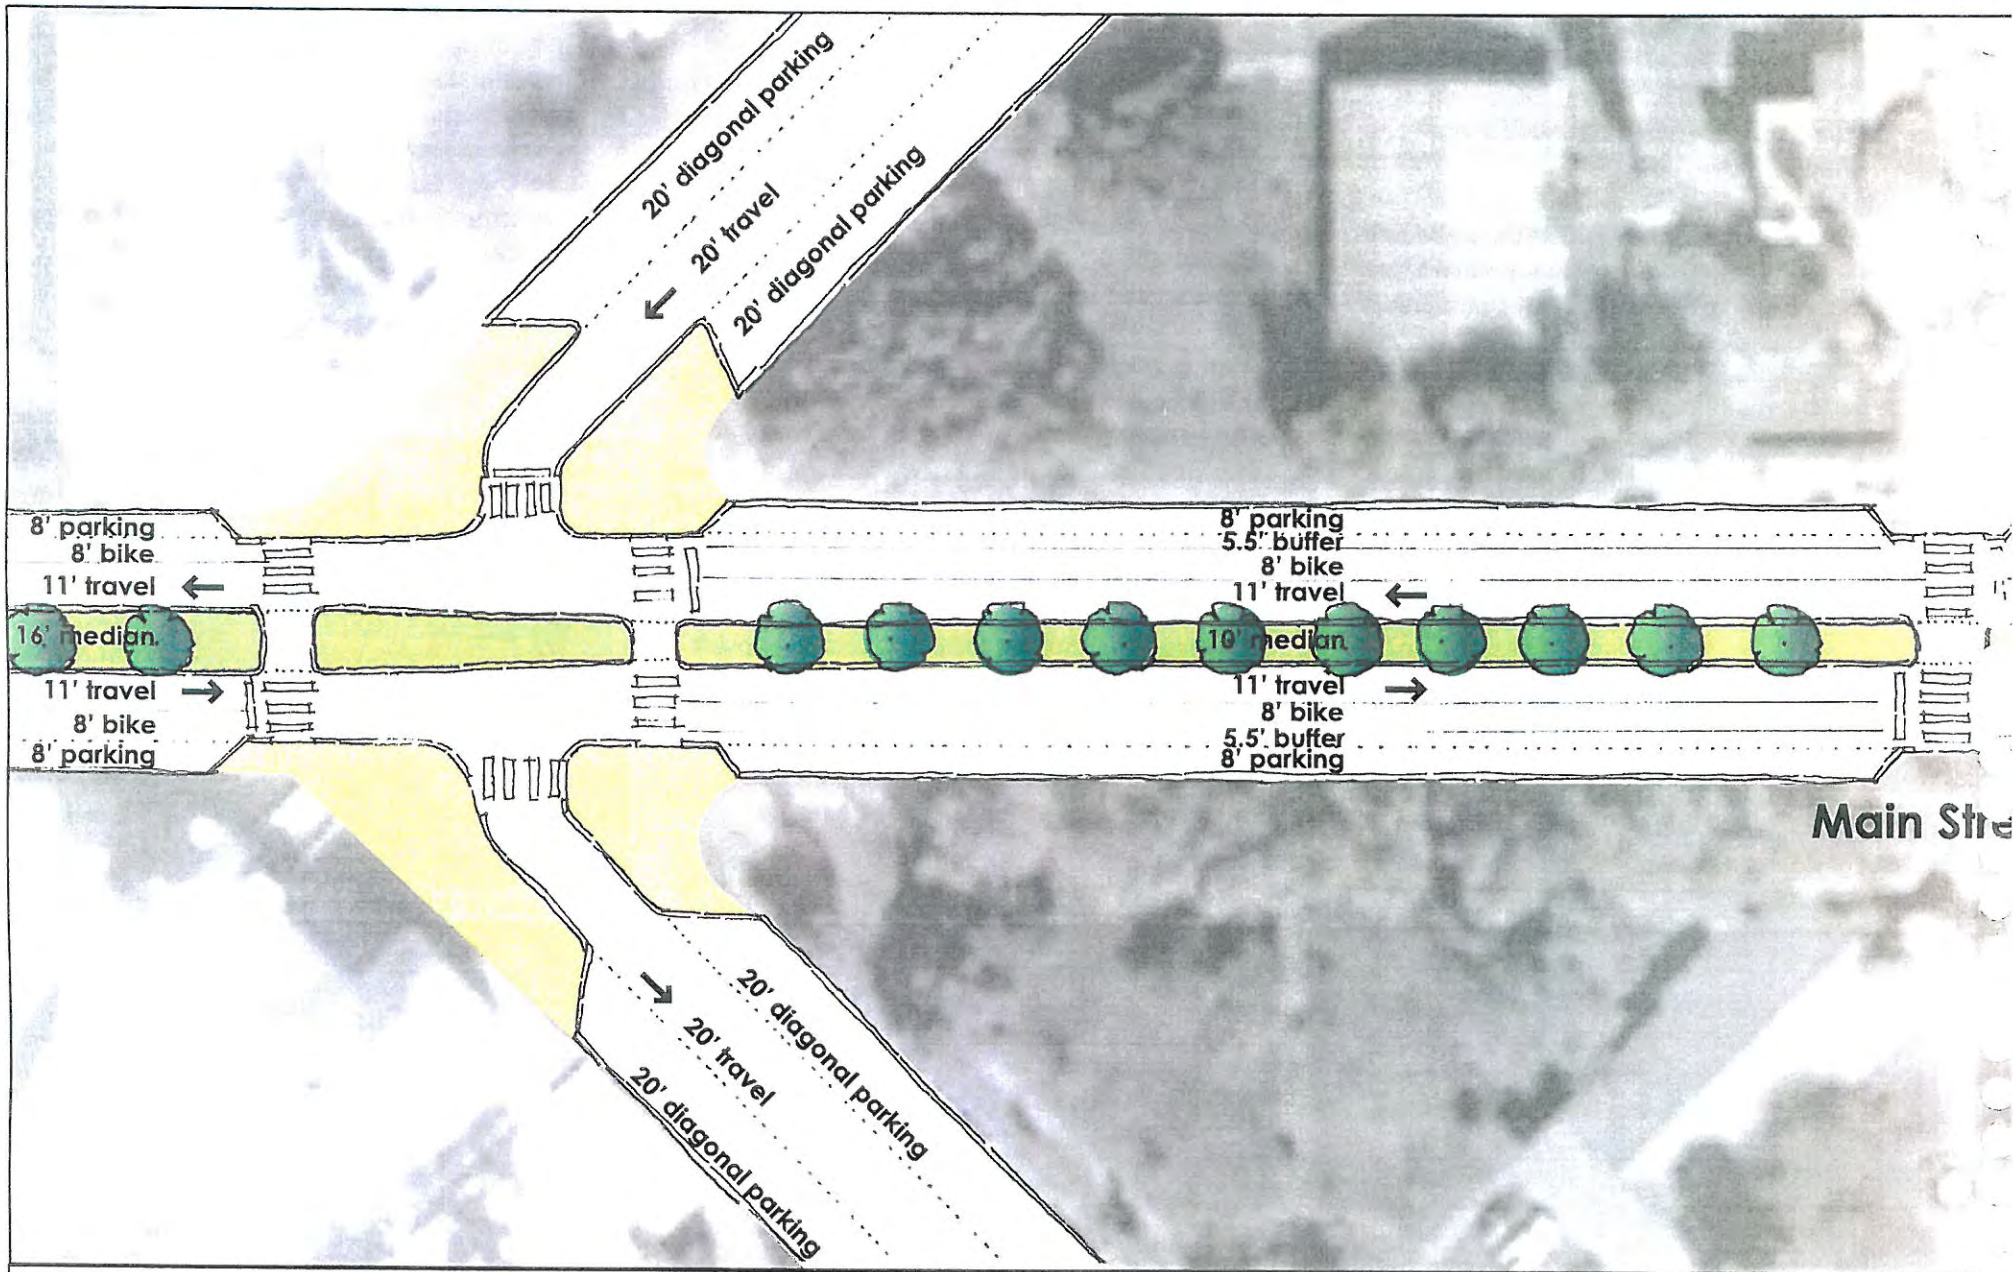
Short-term recommendations for Main Street through Plaza Park.
